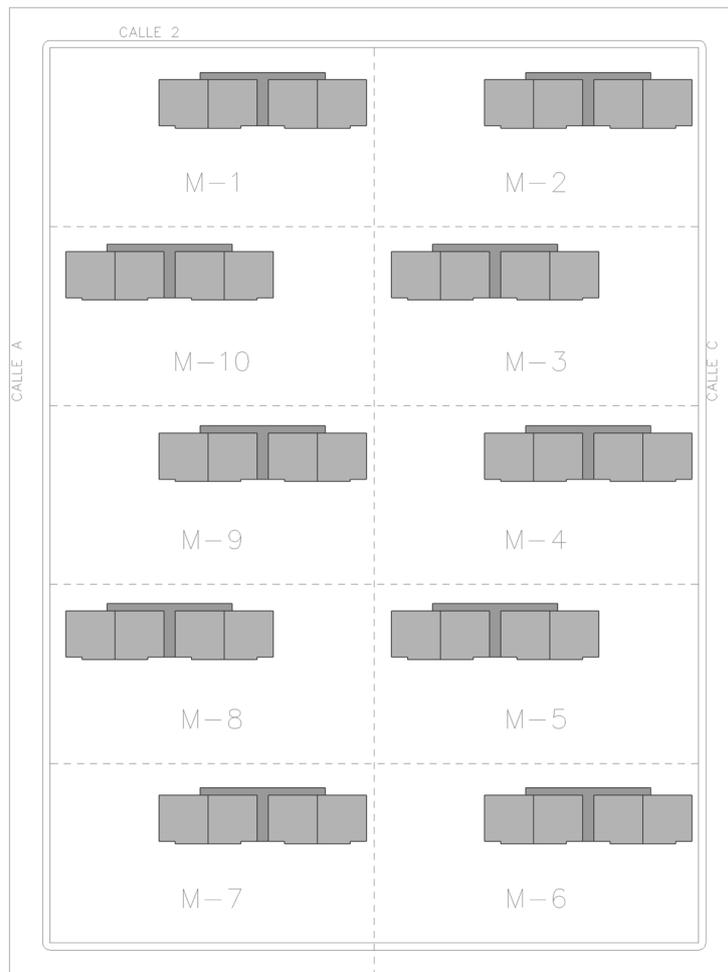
Alternative B, resulting street and 10 plots layout (numbered M-1 to M-10), each of them holding one multi-family building with 16 dwelling units.
